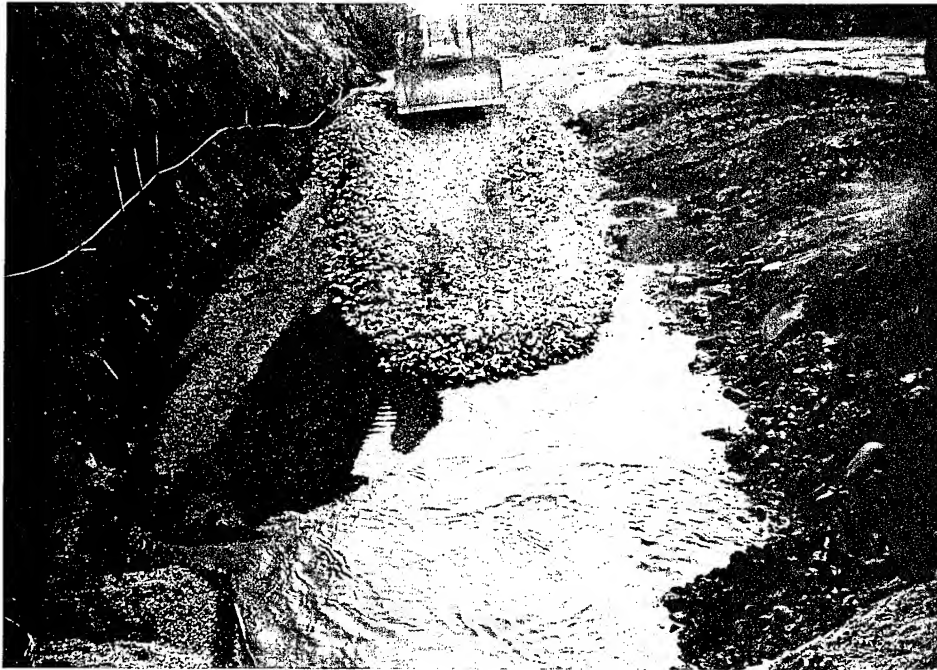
After overexcavating to remove the soft, saturated alluvium, the foundation was brought back up to grade with angular gravel and cobbles.
